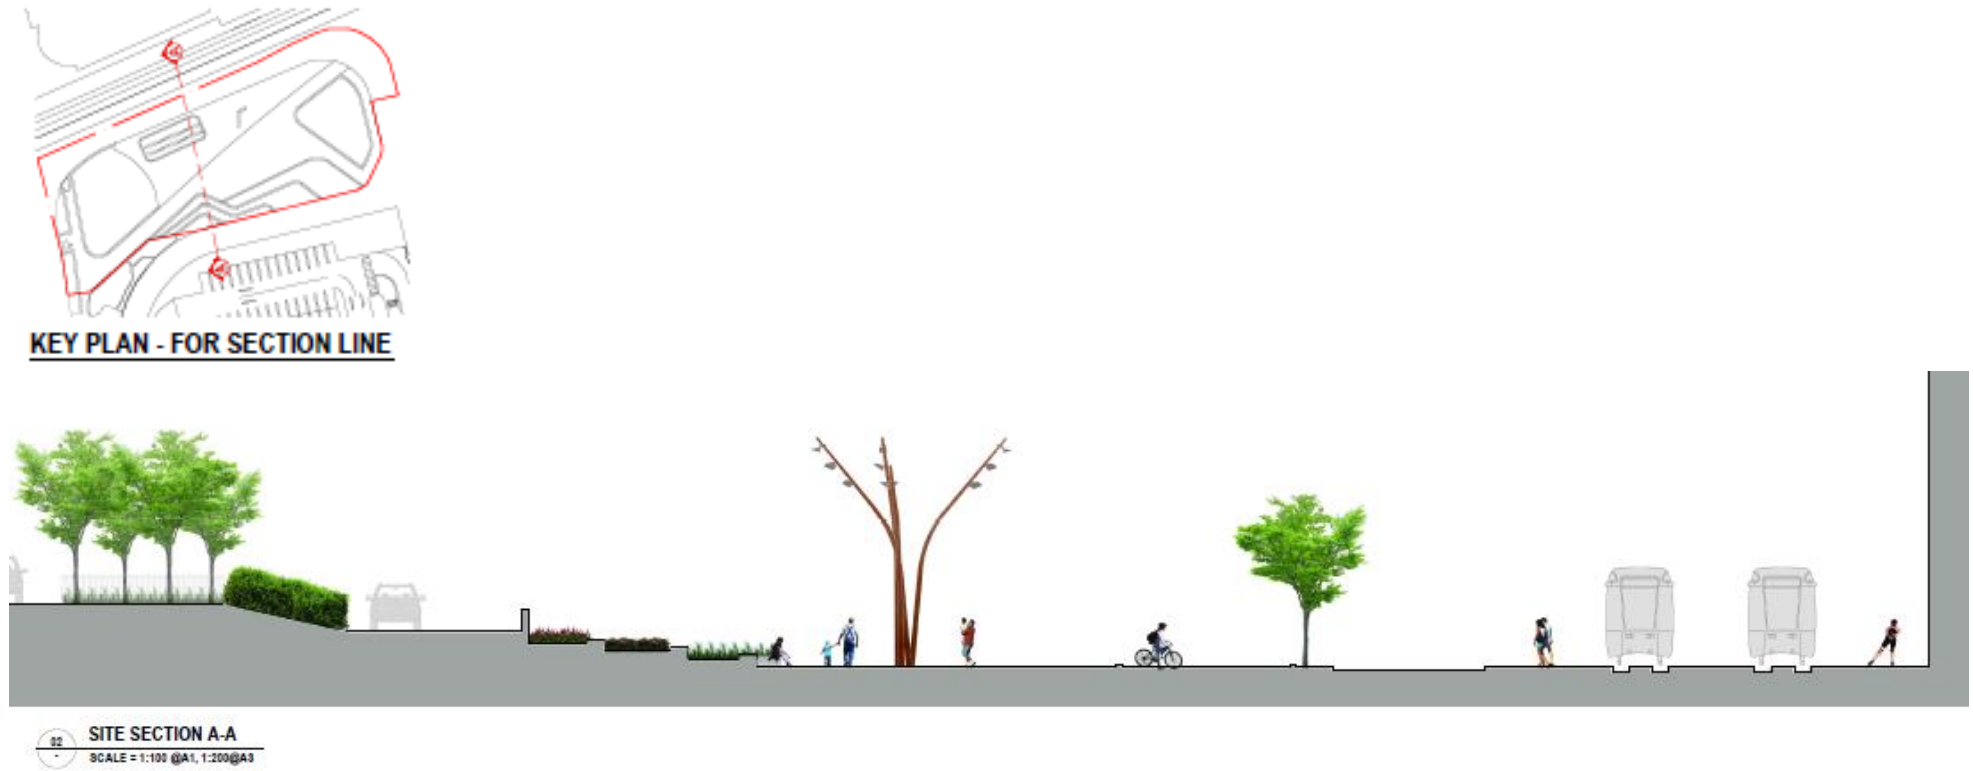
Proposed section (Blessington Road and Belgard Square West junction)
